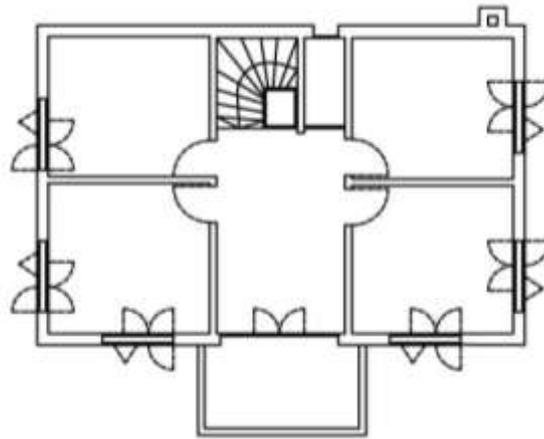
First floor of the house at 135 lot 30 parcel
